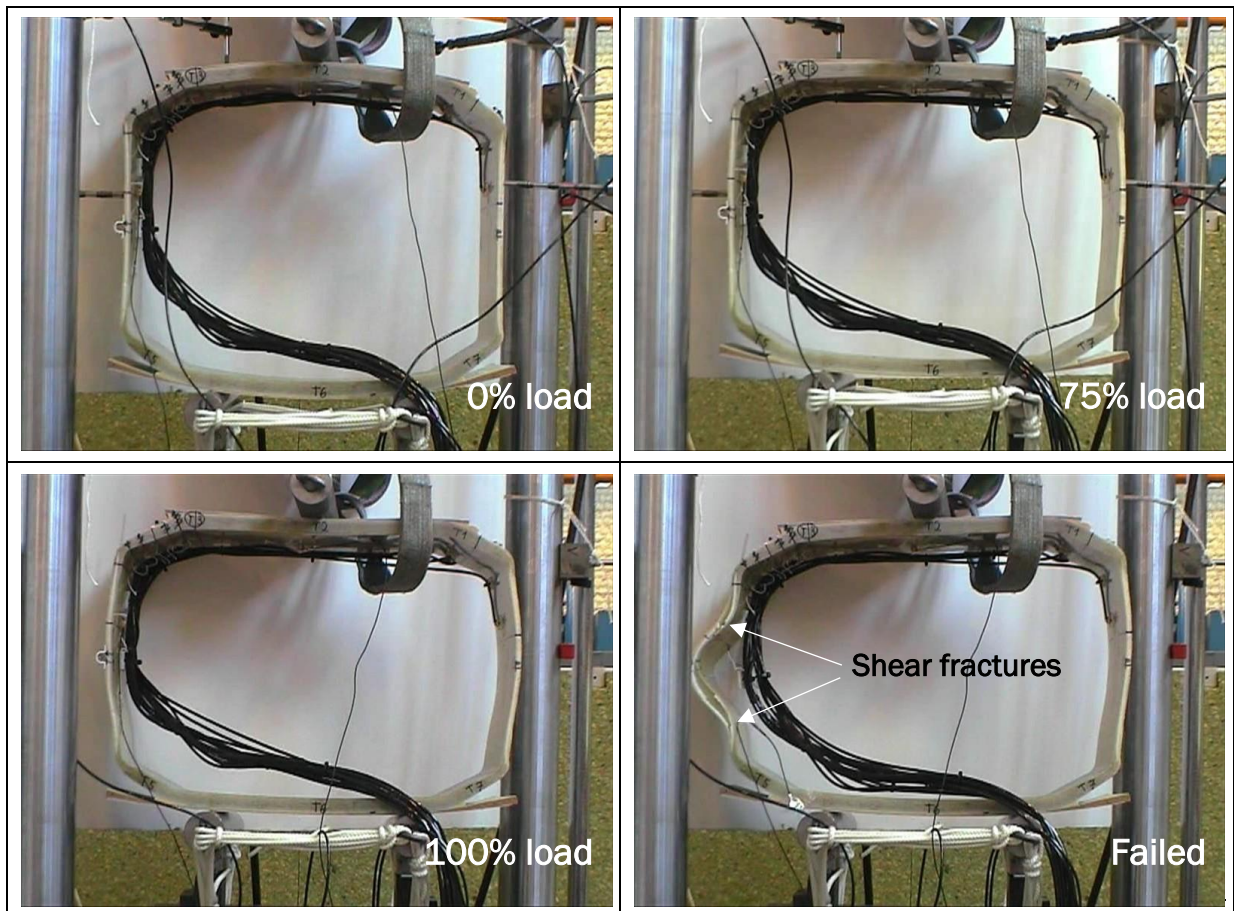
Picture sequence showing specimen deformation from unloaded to failure. First test series from inner part of box girder (30% length position)
